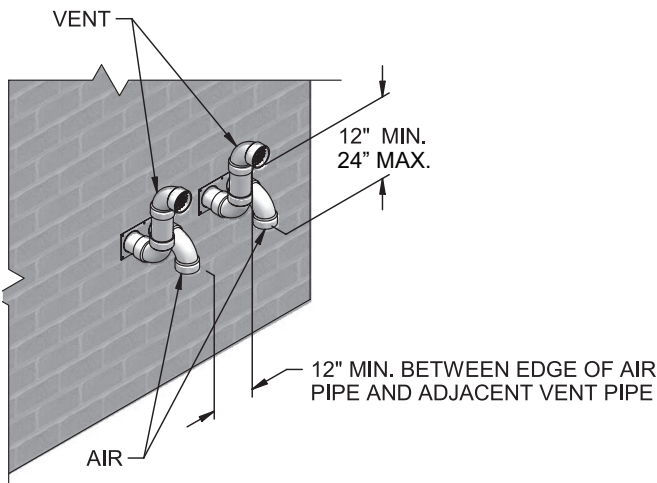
Clearance to Forced Air Inlets (Sidewall Vent Kit Shown)
